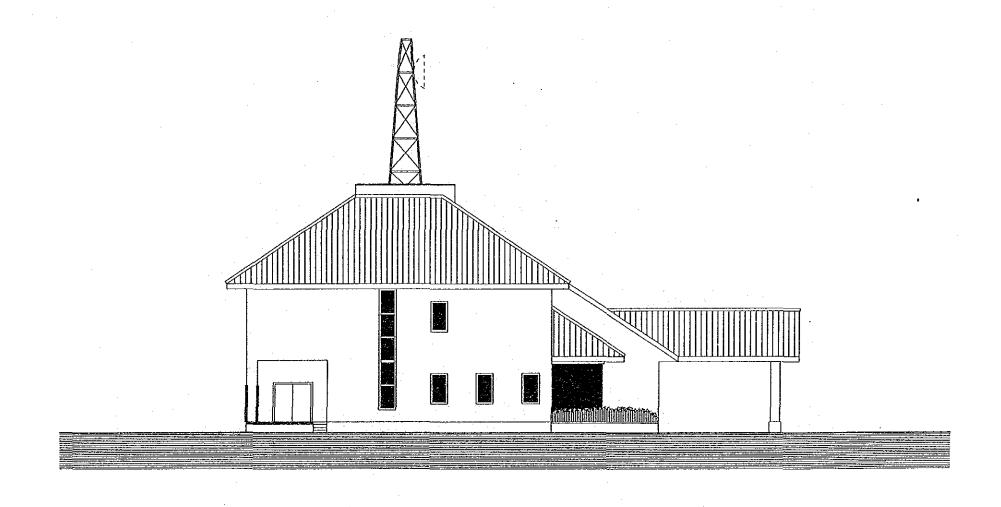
NORTH ELEVATION, SCALE 1:200
